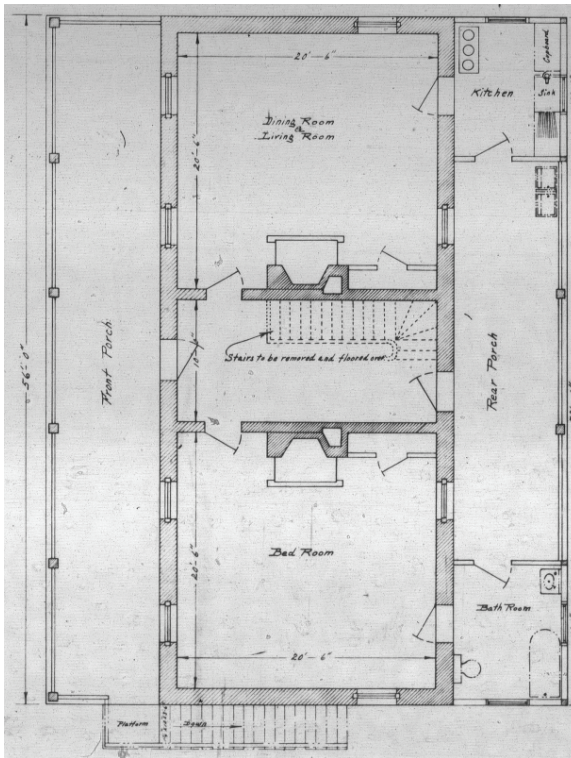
Keeper's Dwelling floor plan from "Repairs & Improvements" to Assistant Keeper's Apartments.
